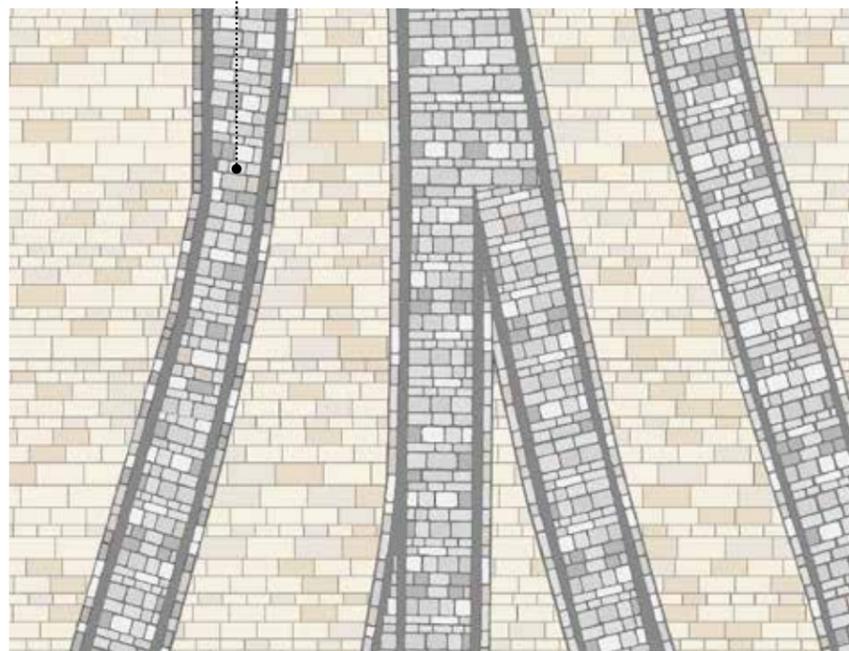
Paving swatch of reclaimed heritage setts inbetween railway tracks in fan plaza
